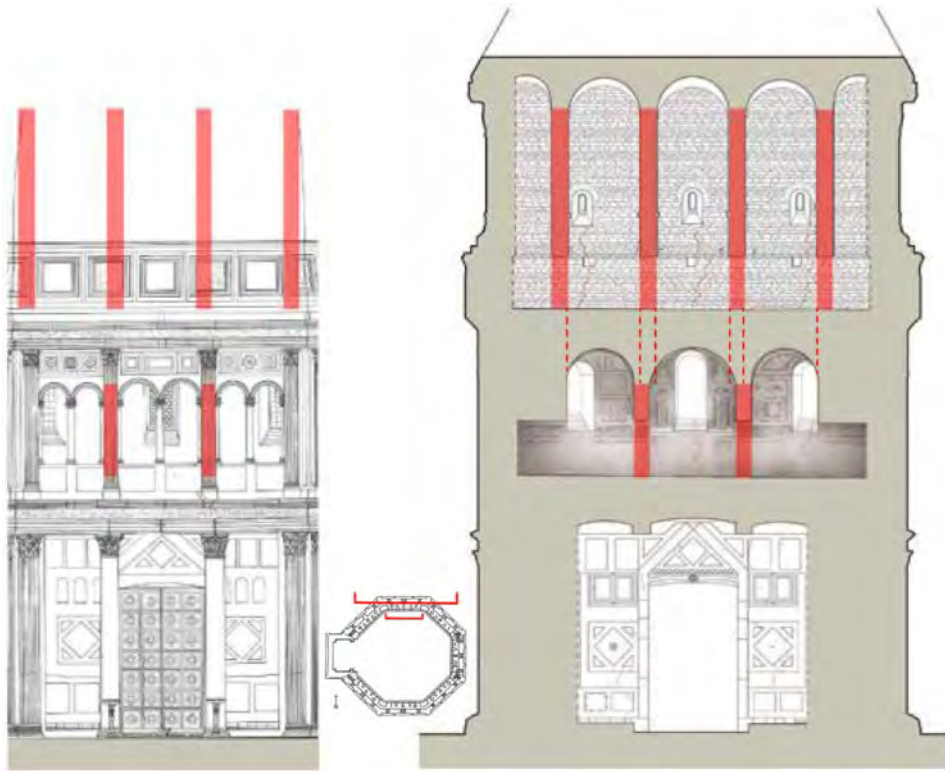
Elevation of the interior north side (left) indicating (in red) the position of the parallel bearing walls; longitudinal section of the north side (right) executed in the intermediate space highlighting the partition walls (in red); the section intercepts the ground floor, the matroneum and the garret.
